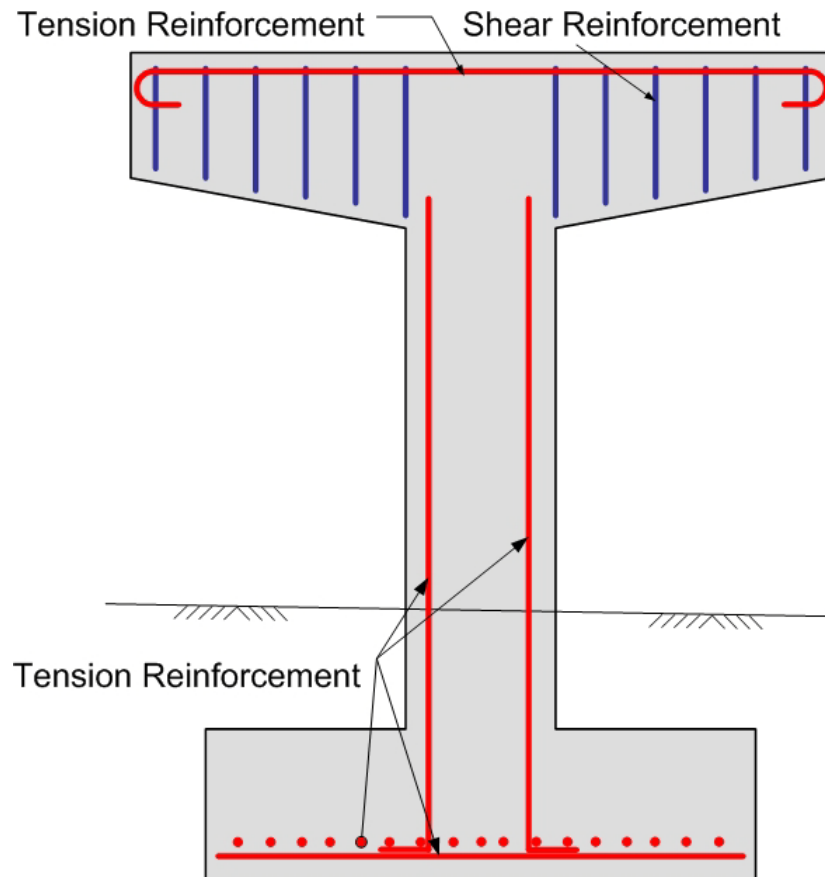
Primary Reinforcement for a Cantilevered Pier
